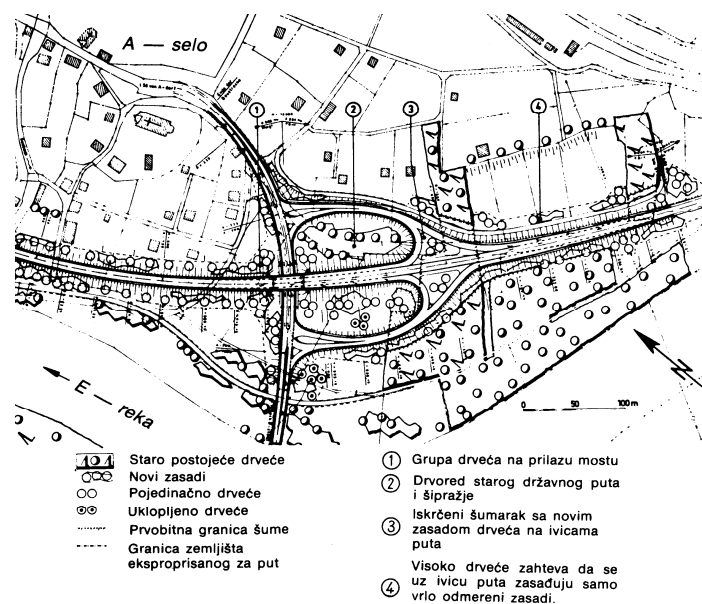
A segment from a plan of a road site which practically fits the existing vegetation with new.
